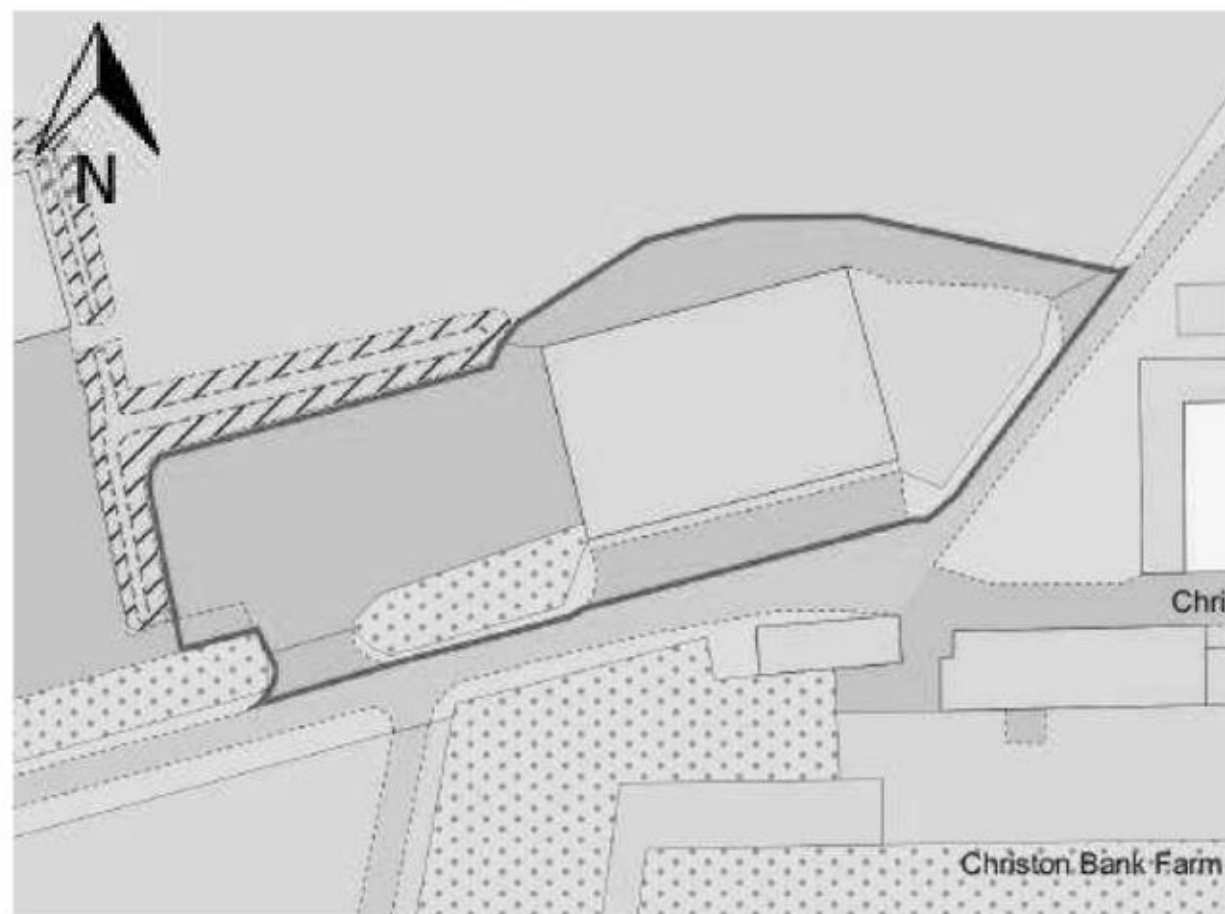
Site Layout Plan with boundaries shown in red (boundaries are indicative only)
